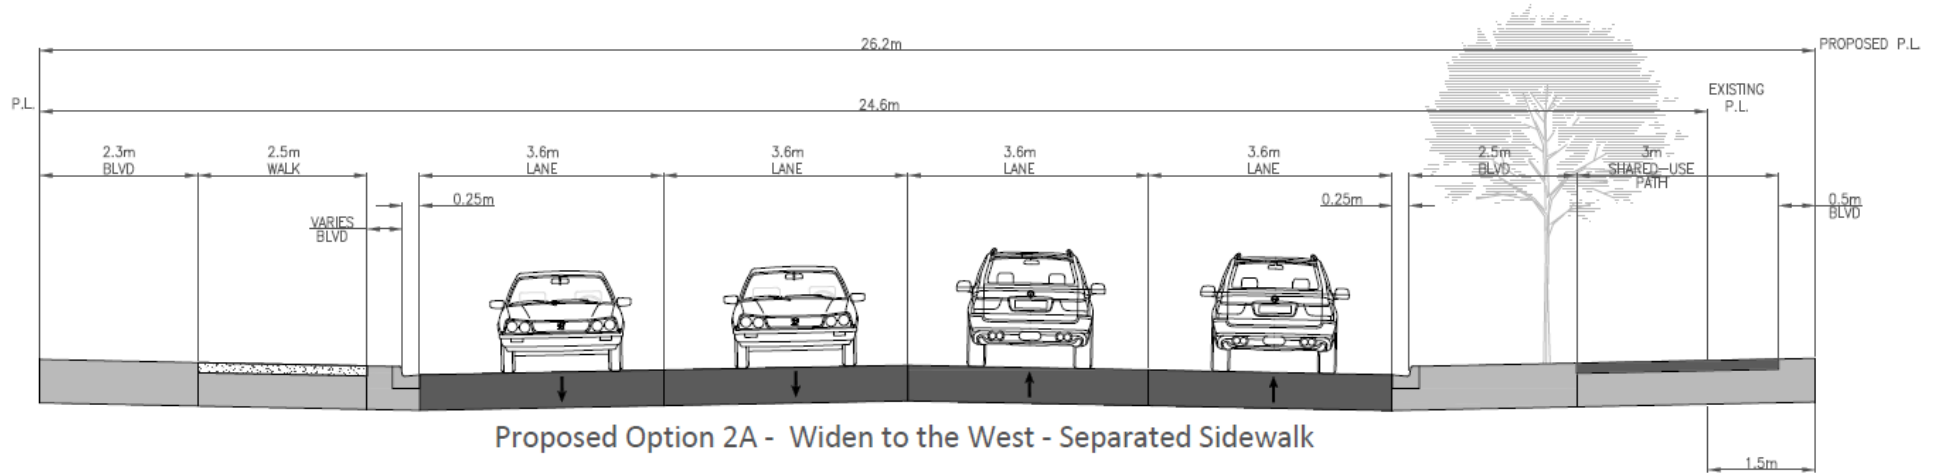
Proposed Cross-Section of 3<sup>rd</sup> Avenue between Duchess Street and Duke Street (Facing North)
